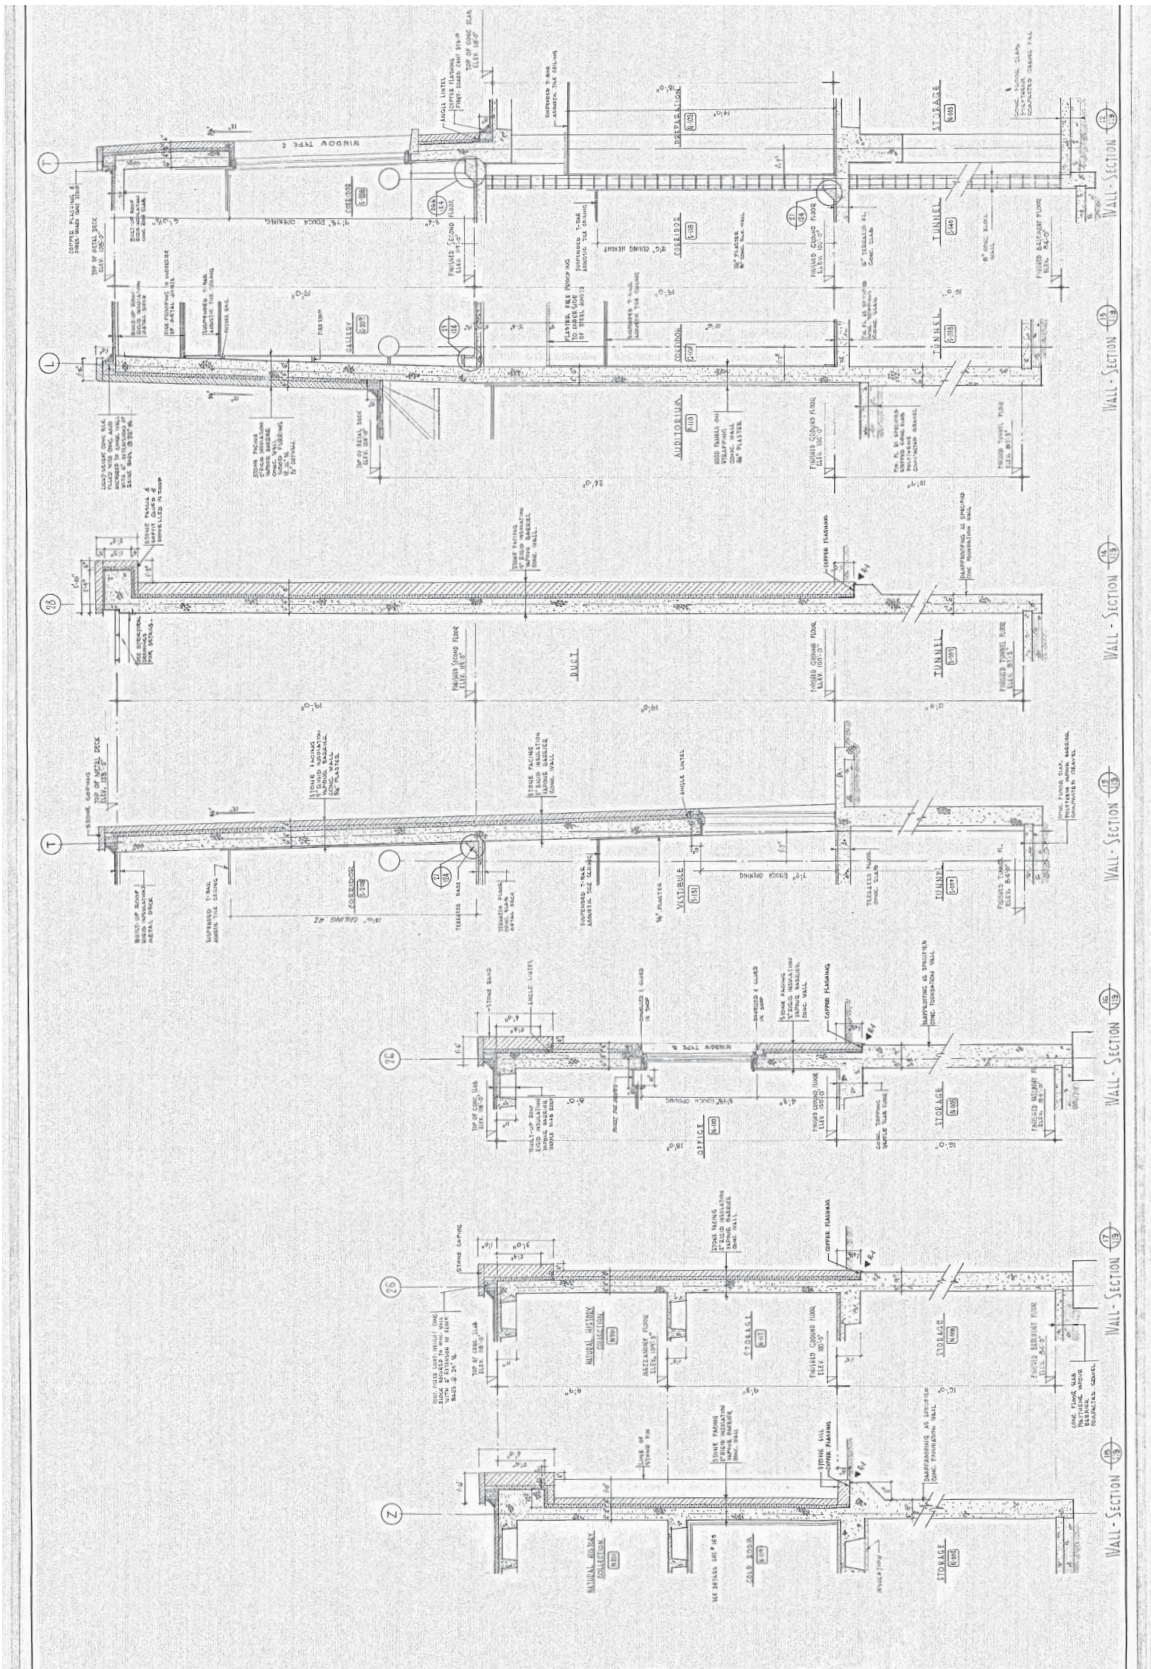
Original Alberta Public Works plans of the Provincial Museum and Archives; Excerpts of wall sections from Alberta Infrastructure Technical Services Branch Archives
